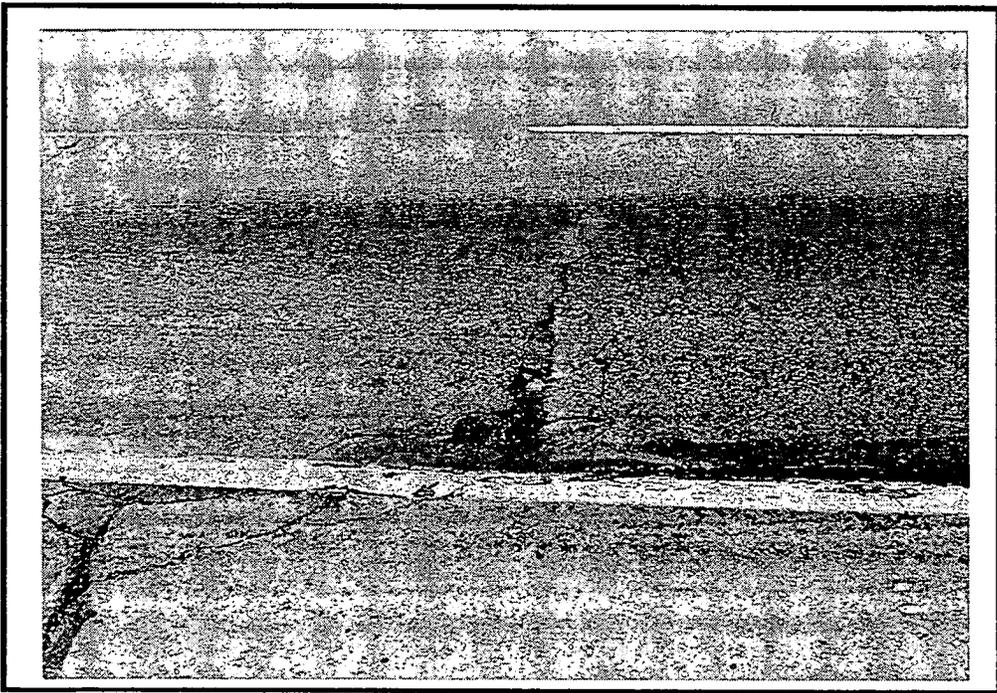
Debonding in Flexible Pavement, Medium Severity
